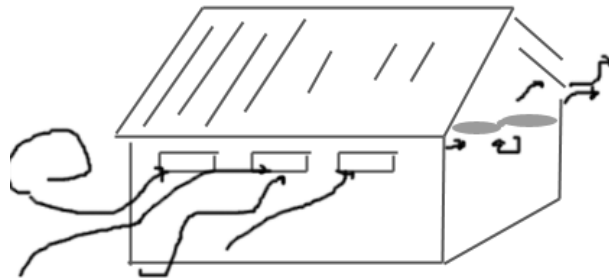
A cut-away rendition of a ventilated dorm typically made of clay brick with corrugated tin roofing. A ceiling fan and open spots in side walls would induce air exchange with the outside.
